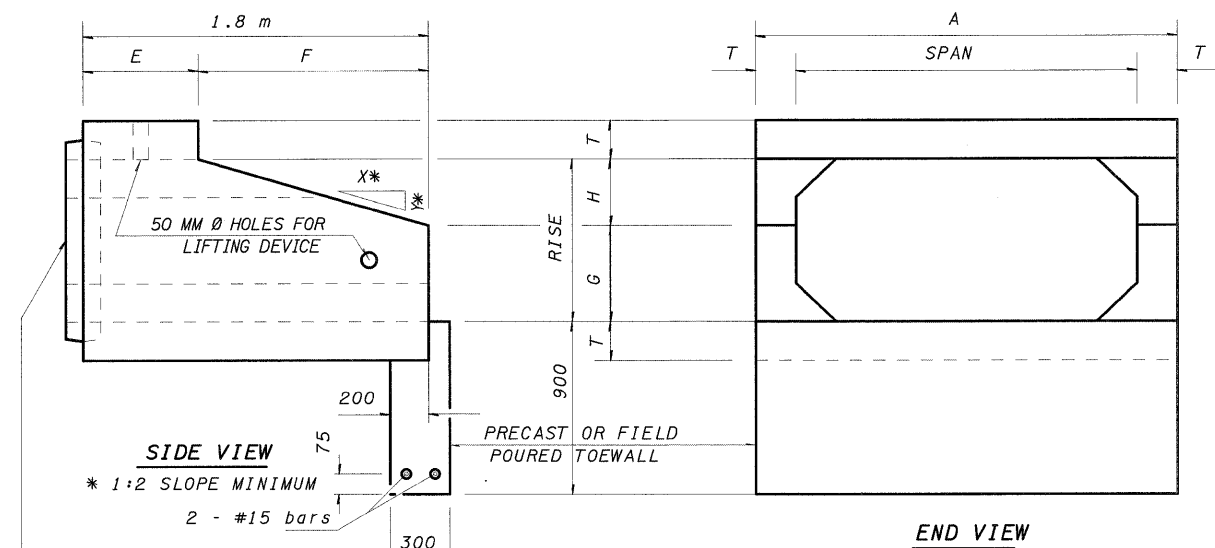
DETAIL OF PRECAST CONCRETE BOX CULVERT END SECTION
